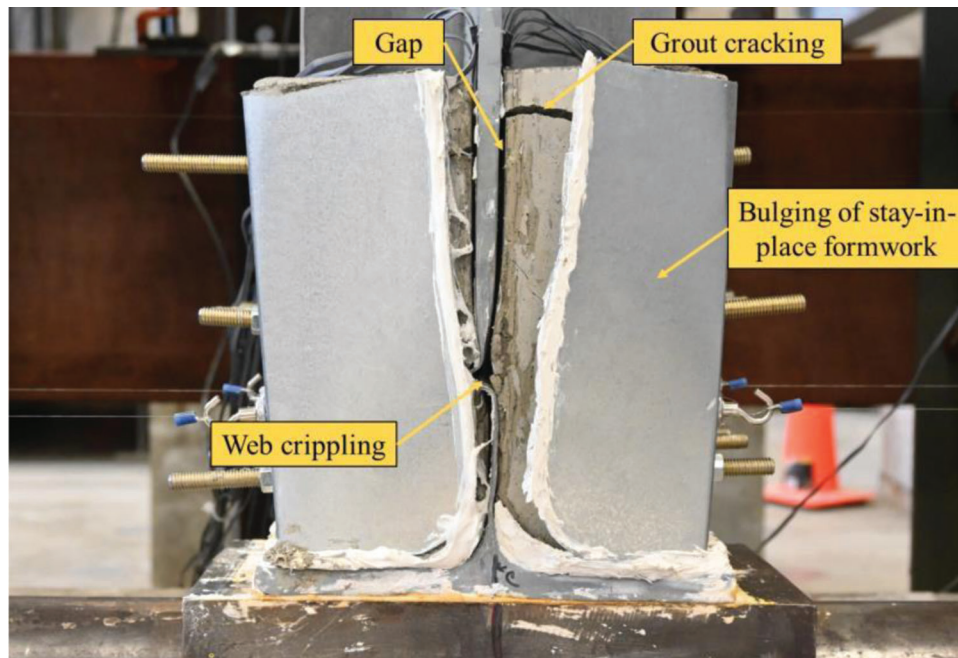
Specimen 6: deformed shape, enlarged front view.
